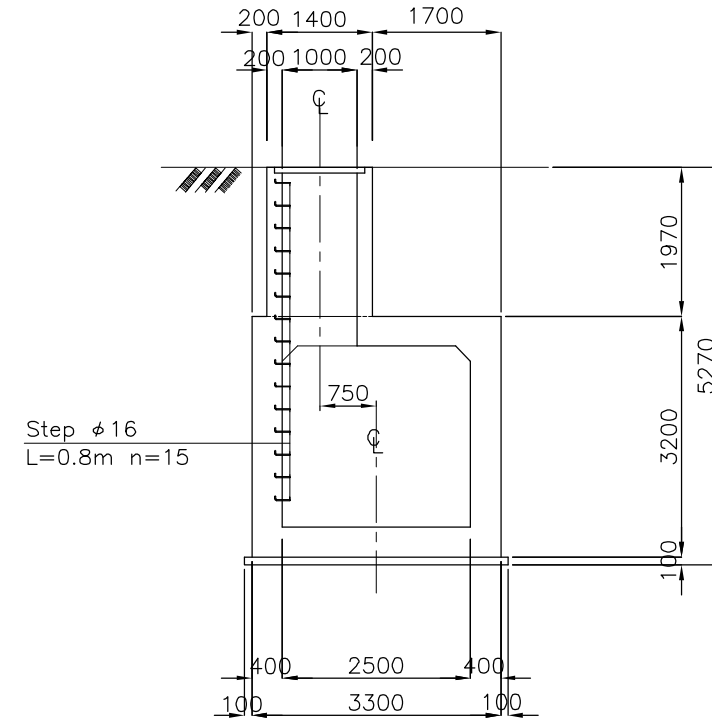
BOX CULVERT 2.2*2.0 S=1:200
